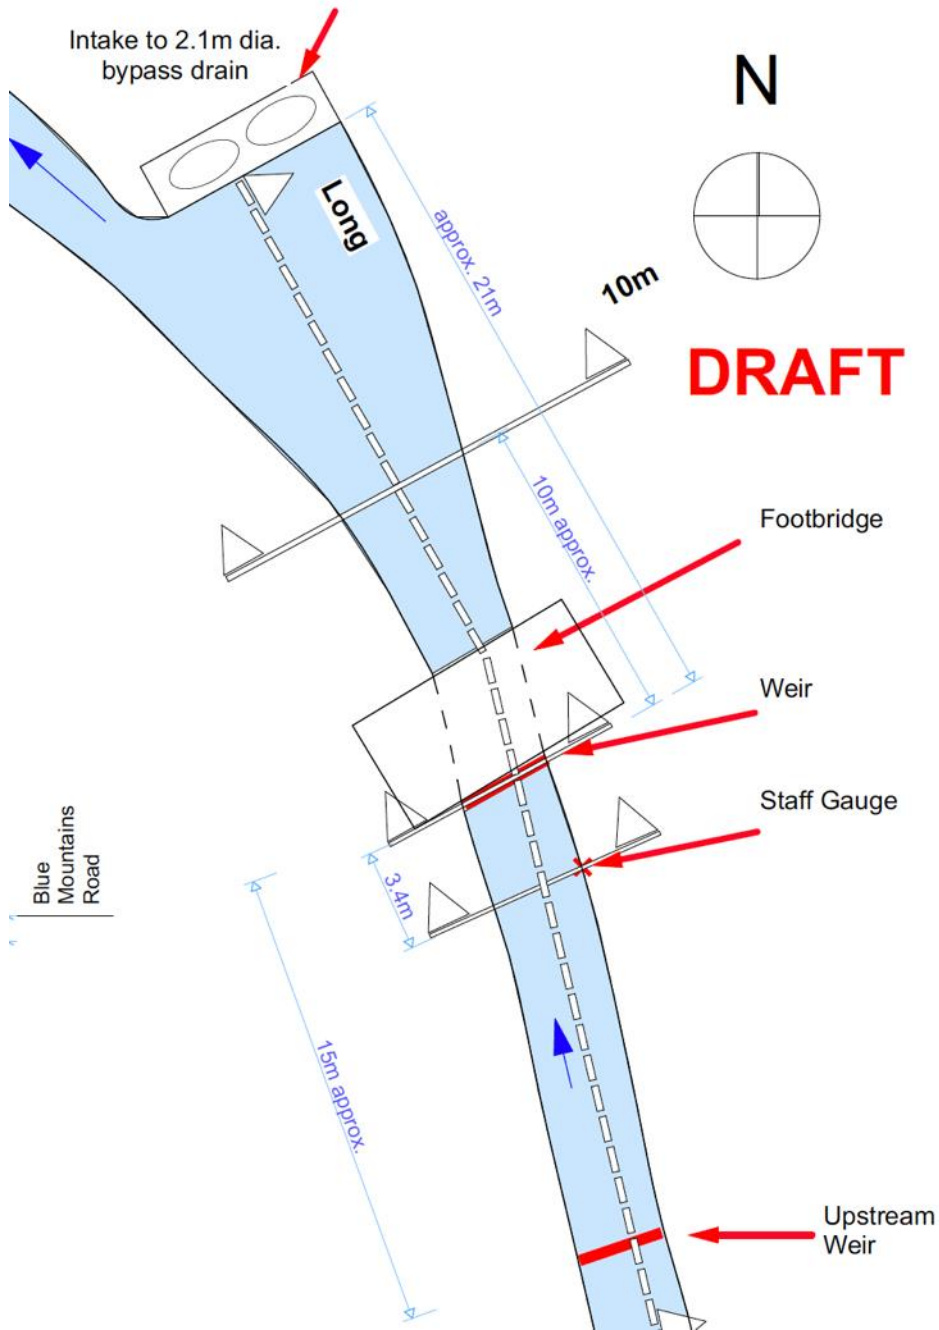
Plan of Staff Gauge Site, Pinehaven Stream
